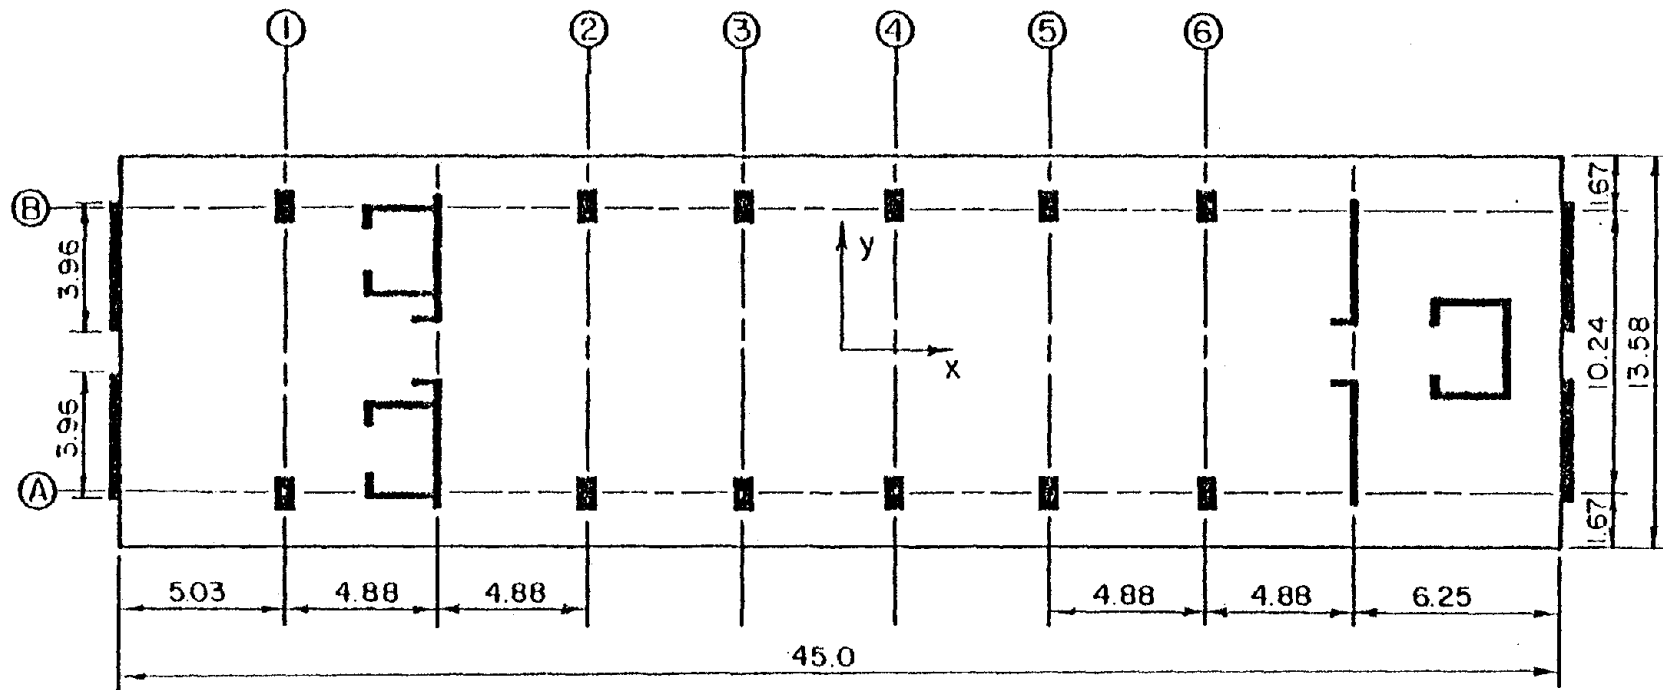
Typical Plan View of the British Rail Building (All Dimensions in Meters).
